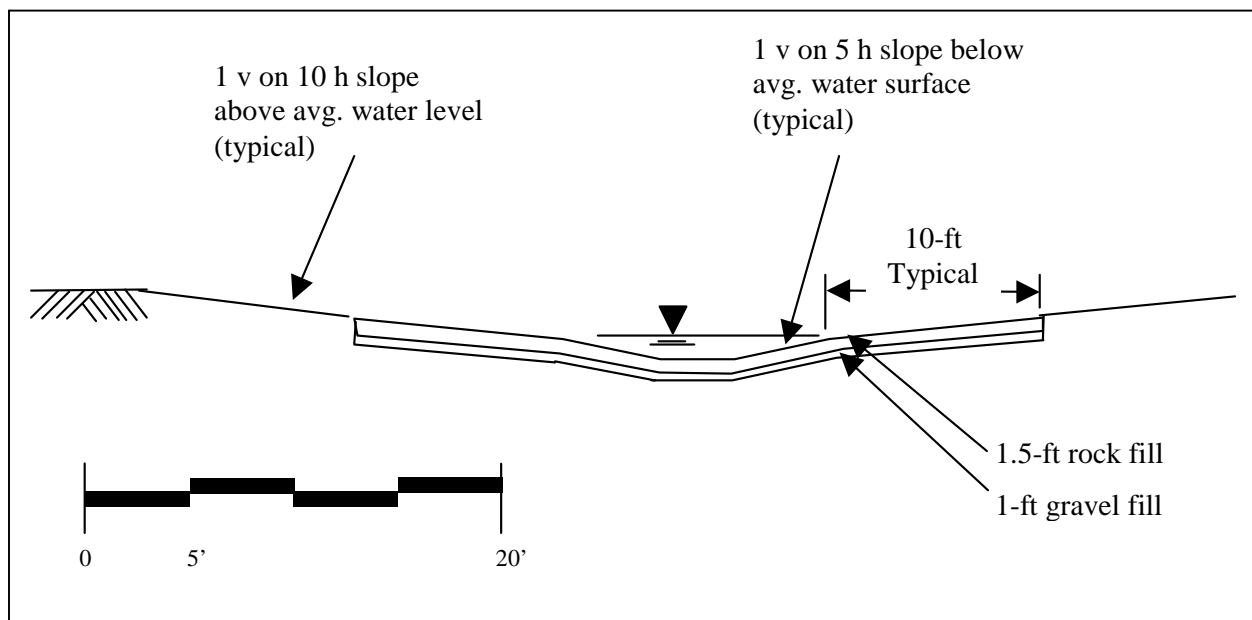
Hardened Ford and Water-Gap Typical Section.
